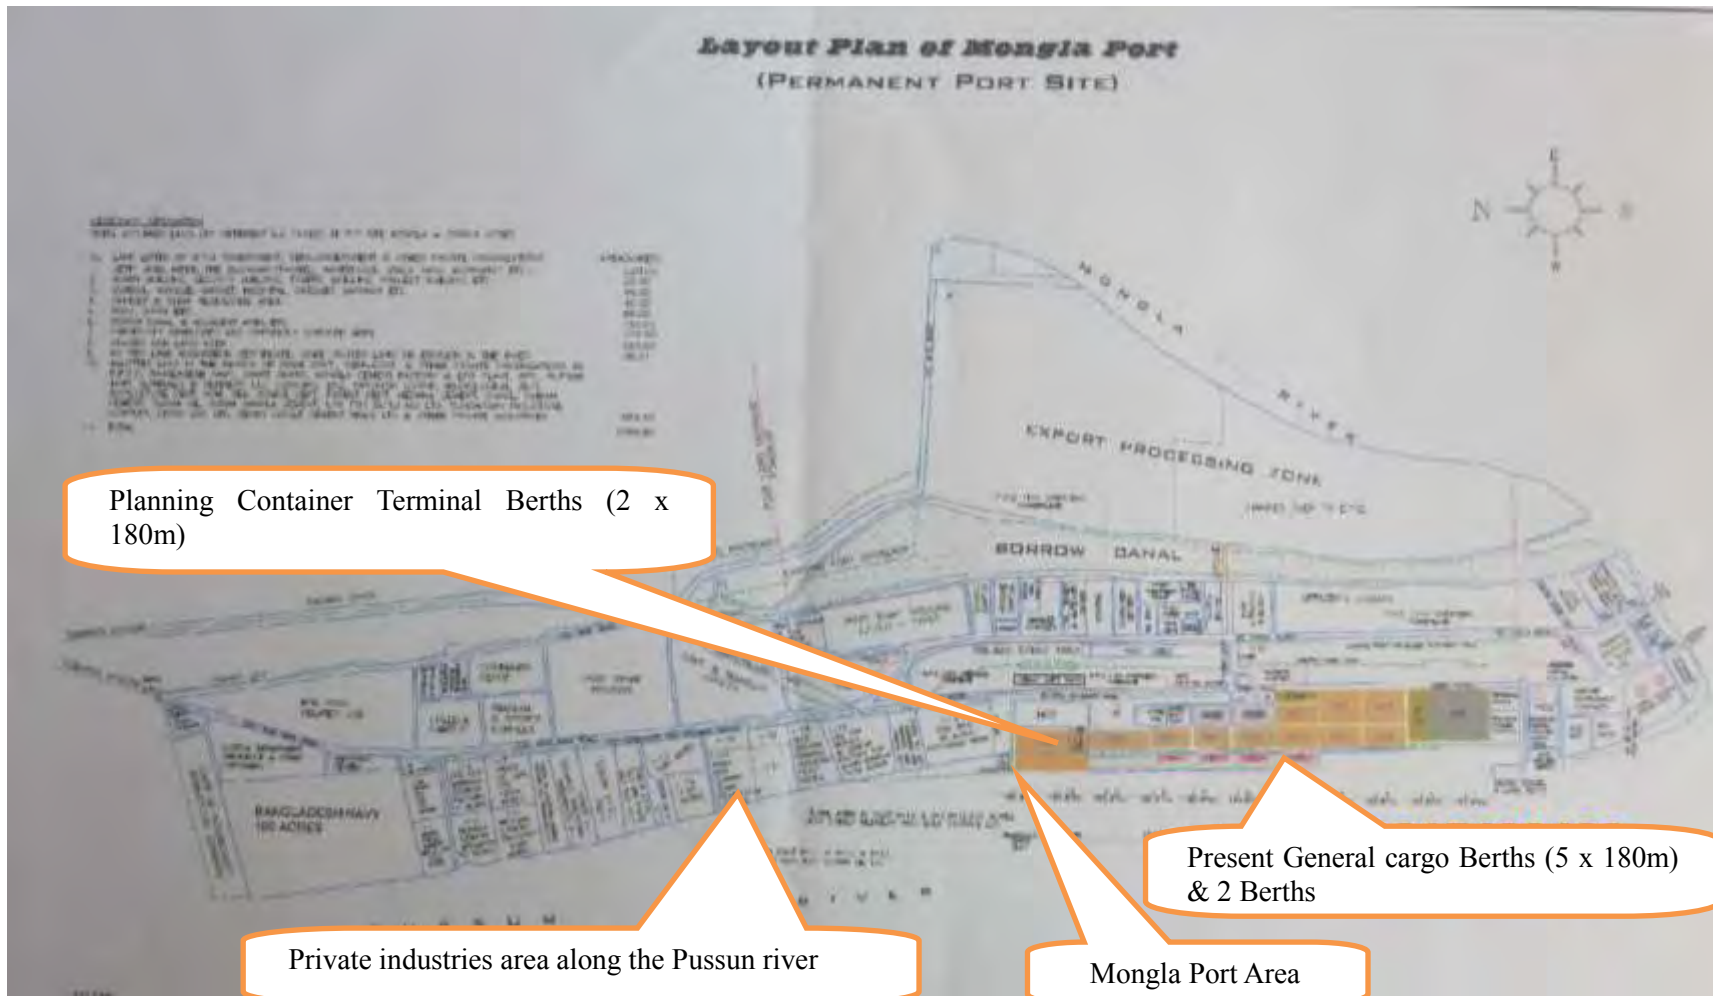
Location of Development Plan of Container Terminal Berth in Mongla Port
